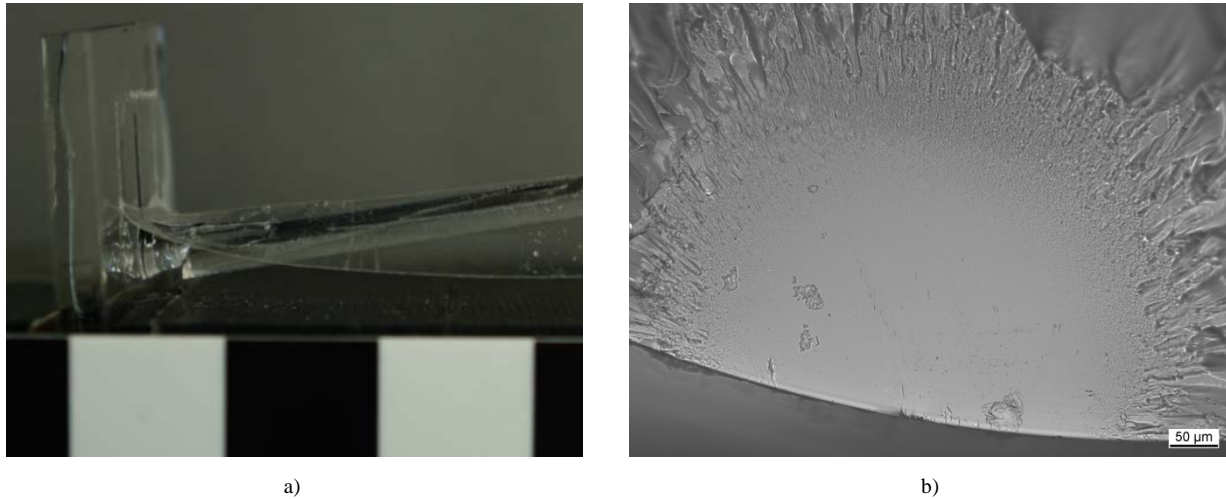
Specimen P-BS34-BS3-t-B-11 after bending test: a) view, b) microscopy image of fracture mirror and fracture origin
